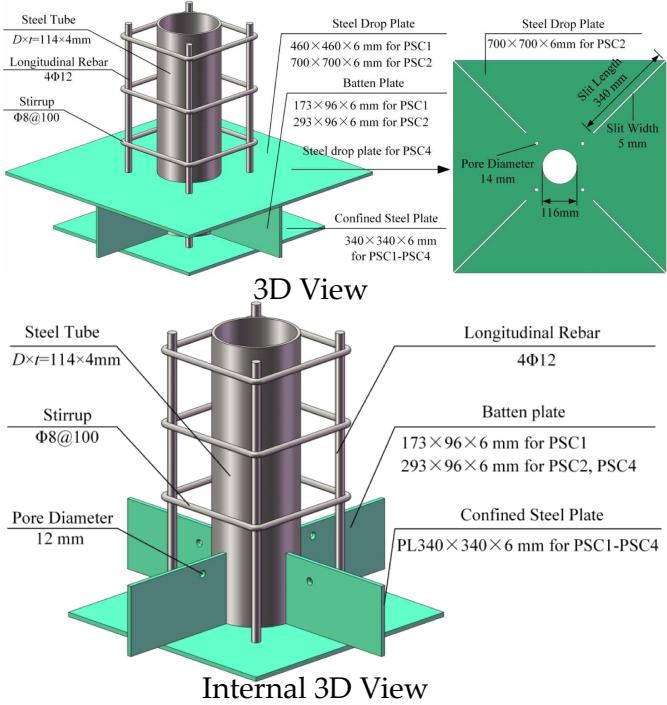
Spatial steel drop panel details for specimens PSC1, PSC2 and PSC4 (Chen et al., 2023).
